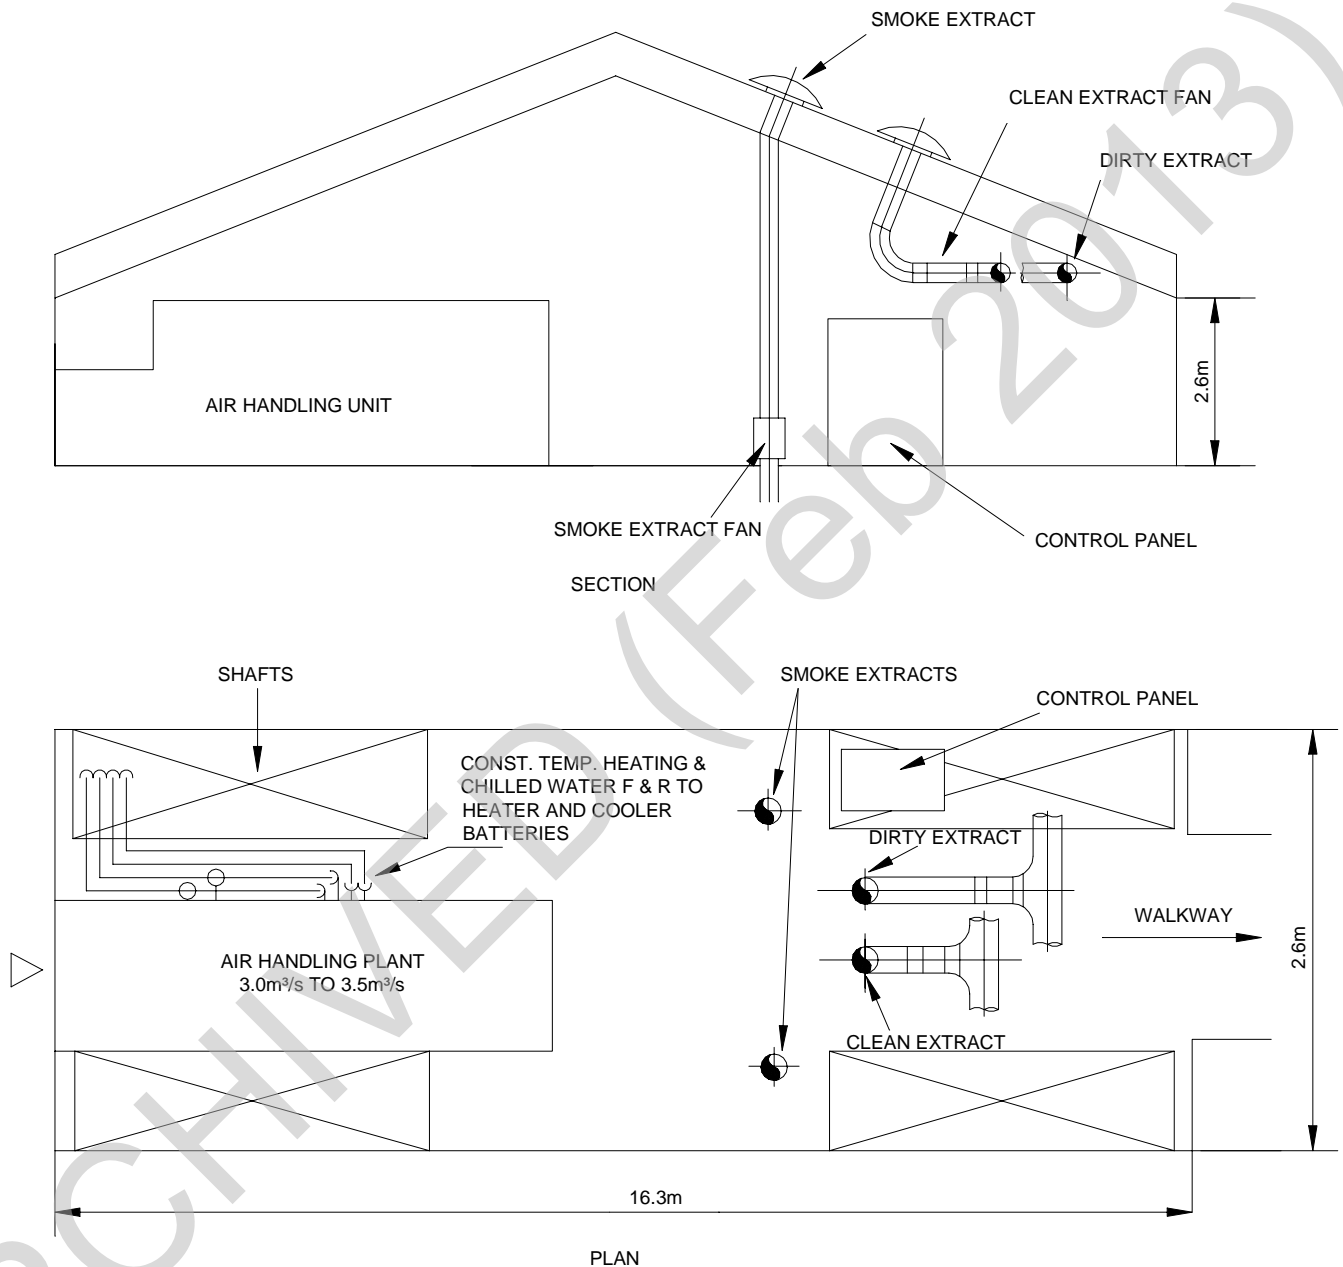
Typical plantroom serving a combination of 24 hr and 9-5 accommodation
